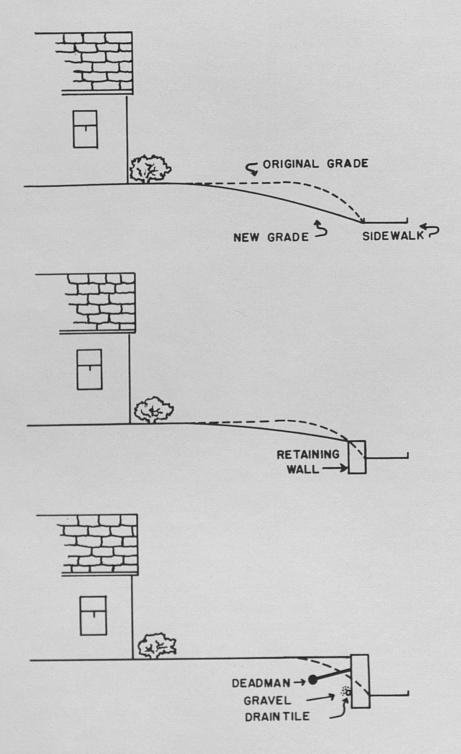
Three methods of avoiding a steep terrace slope. Top: Fair, slope is reduced. Middle: Good, small retaining wall further reduces slope. Bottom: Best, full retaining wall with gravel bed and drain tile to guard against freeze damage to the wall, and anchored to increase stability.
